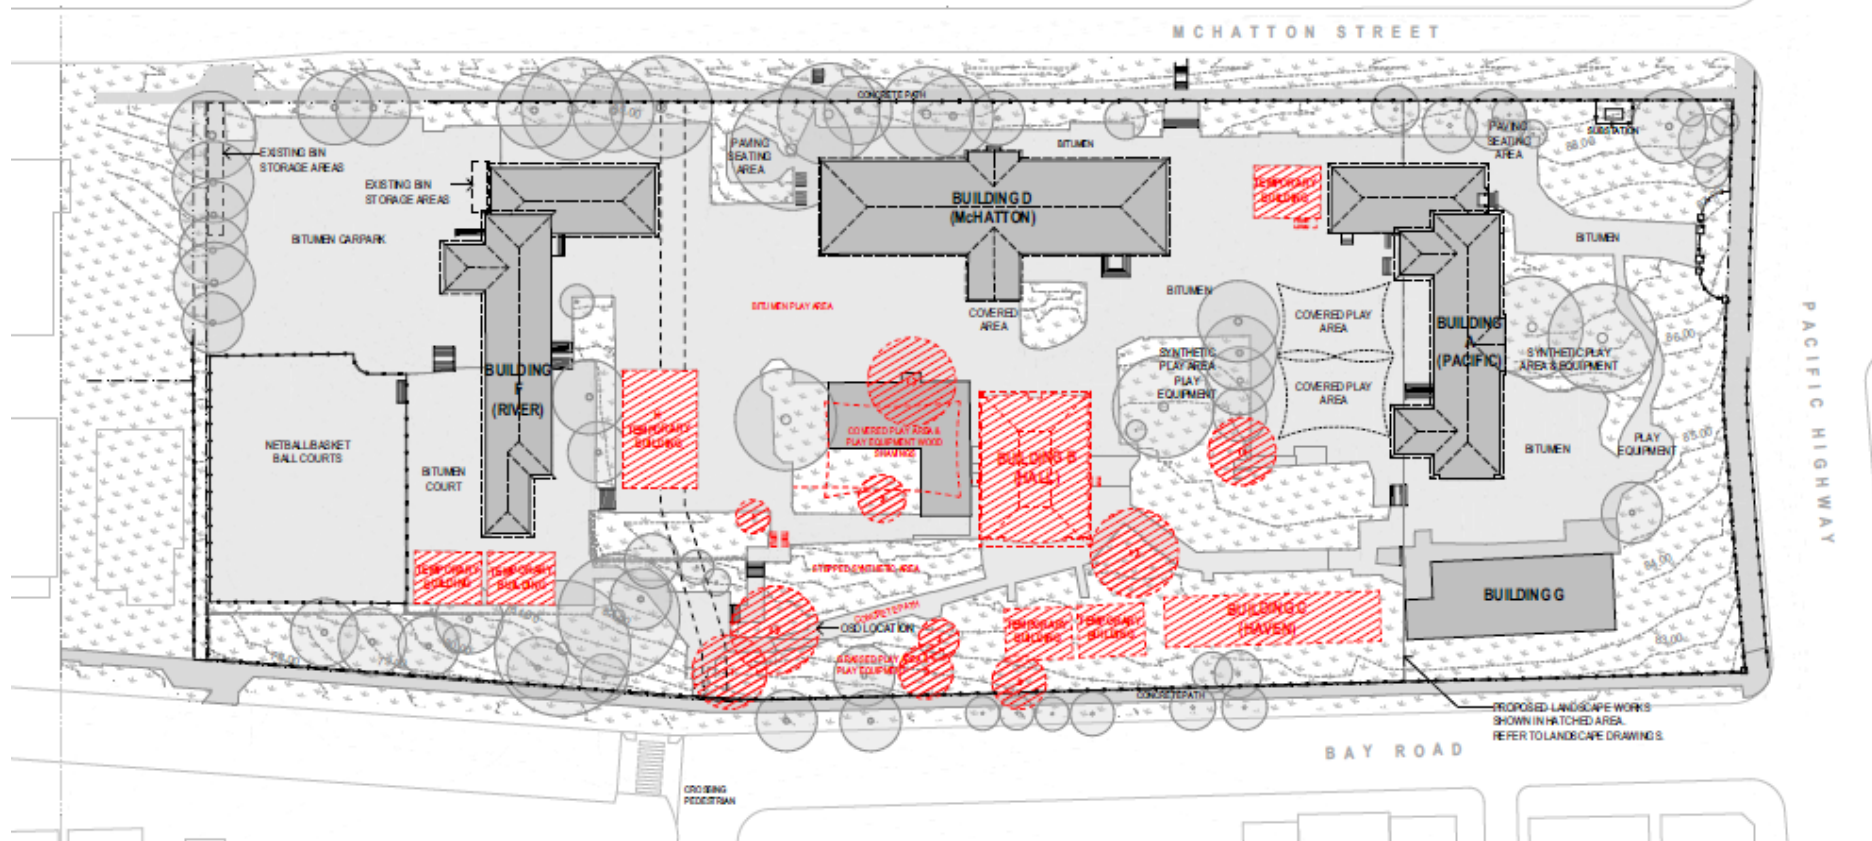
Existing and Demolition Site Plan. Source: Fulton Trotter, 2021; Drawing No. SD-1001, Rev E, 13.8.2021.
